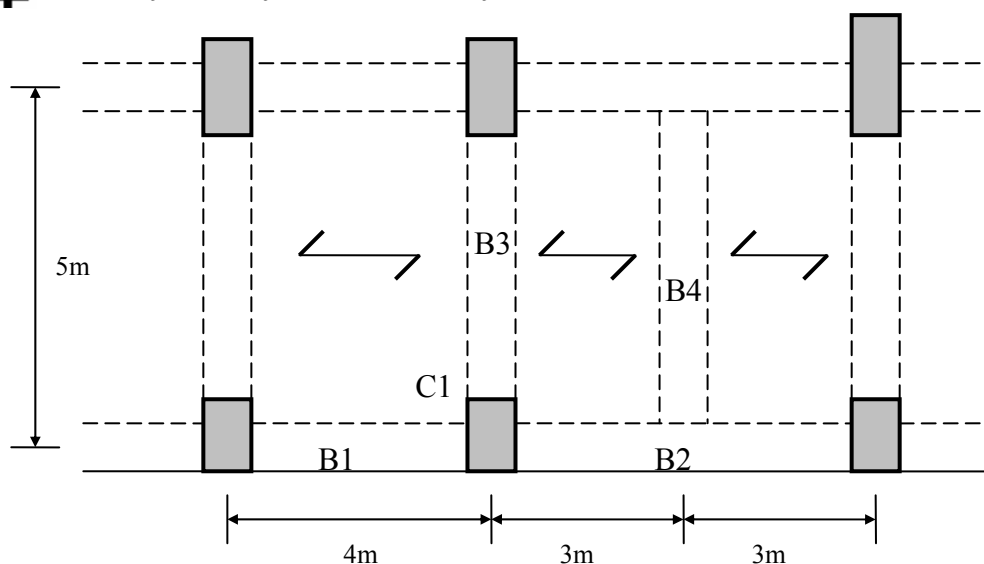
Plan for illustration for determination of design axial load and moment on column by the Simplified Sub-frame Method
